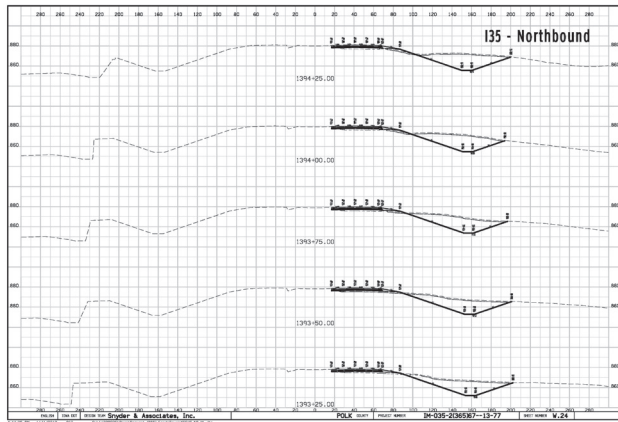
Traditional cross sections used to assist designers with visualizing how the roadway should be graded.
